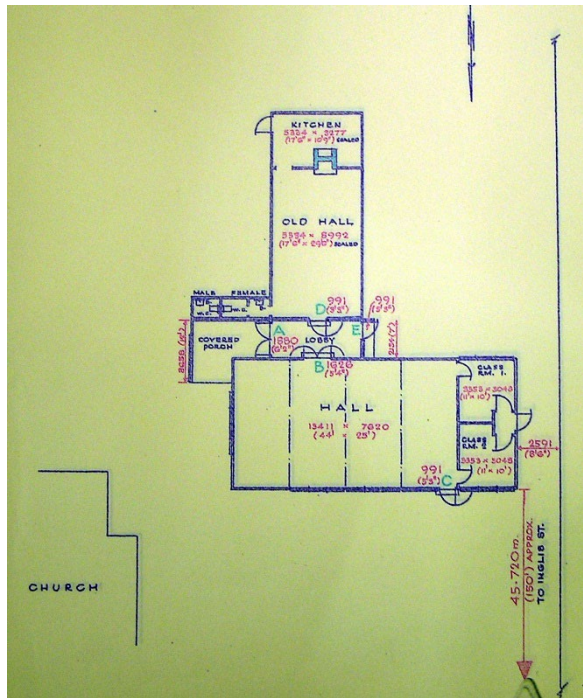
Plan of Robertson Memorial Hall (rear) & Proposed Hall, 1958.
